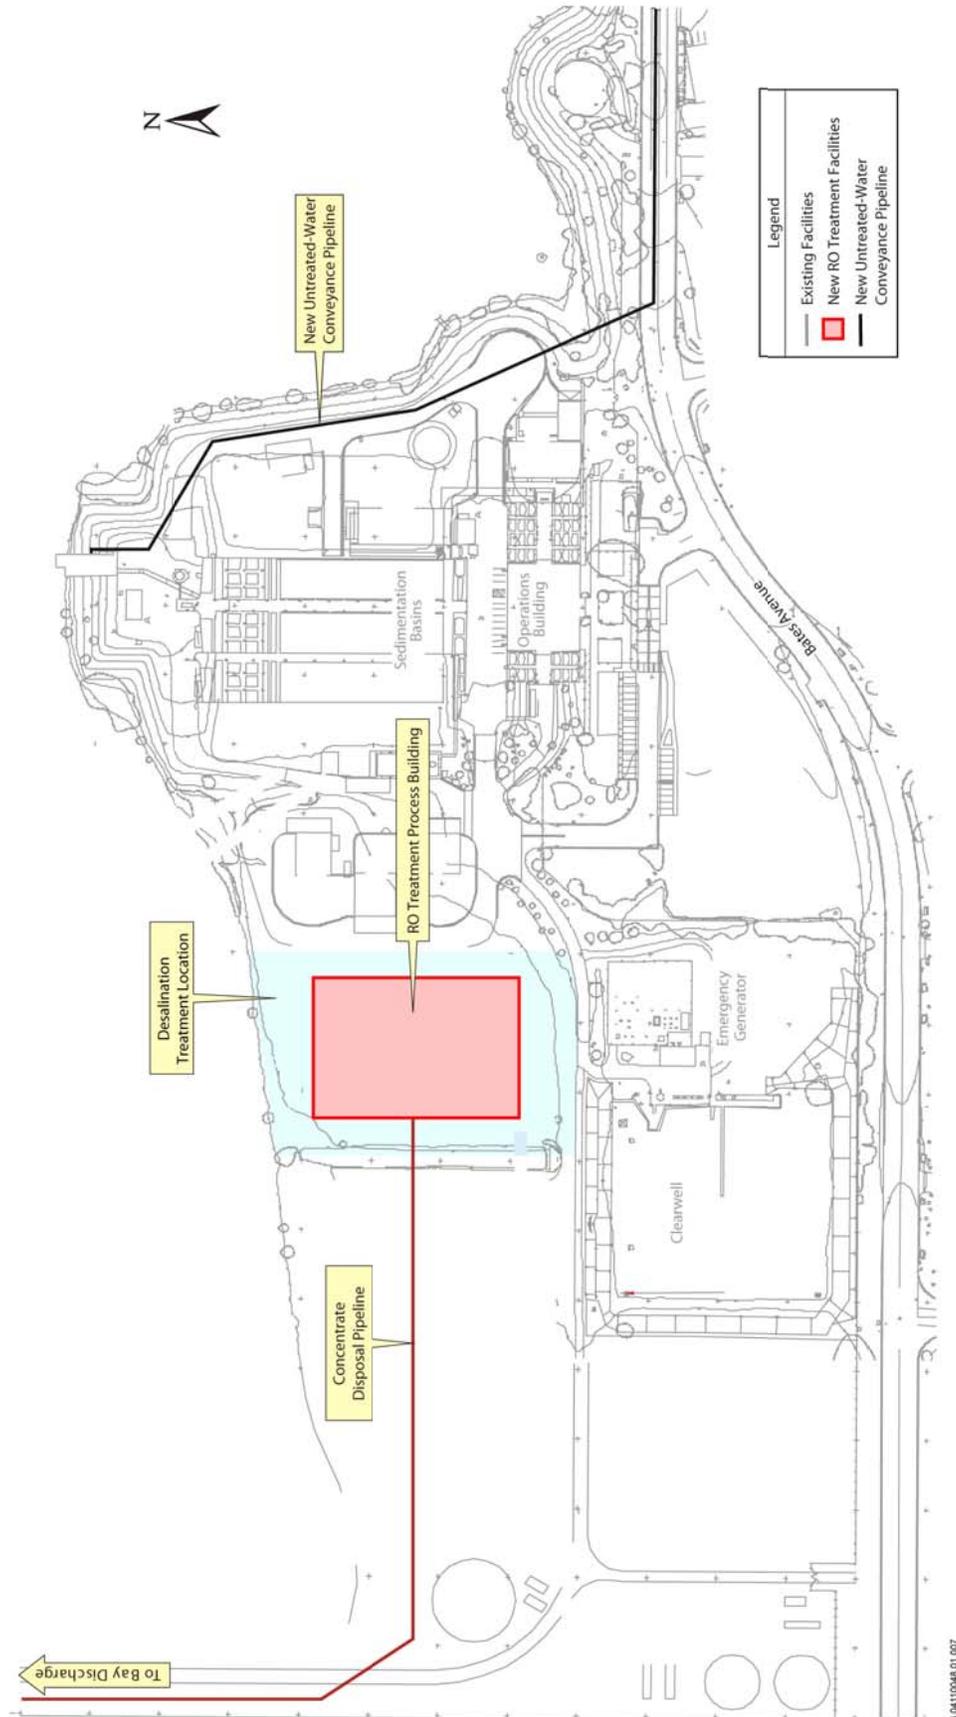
Plan 2 – Location of the Proposed Desalination Treatment Plant at Bollman WTP Site
